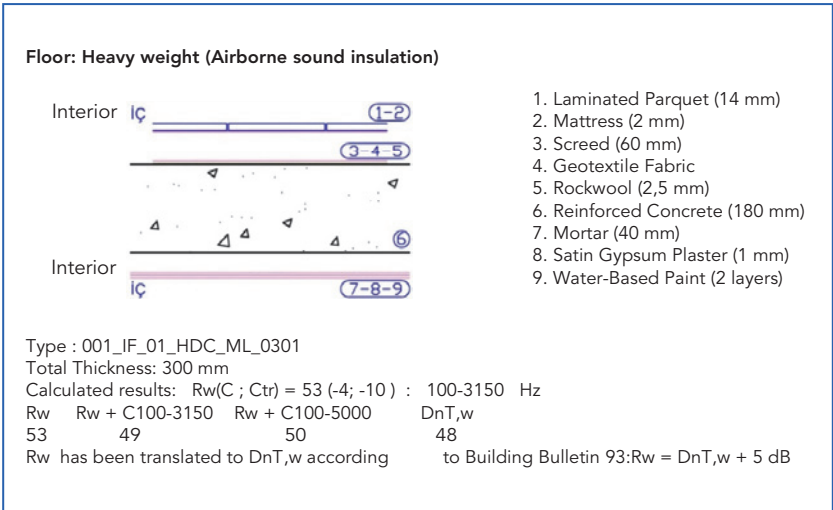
Heavy-weight floor. Construction details and sound insulation data.
